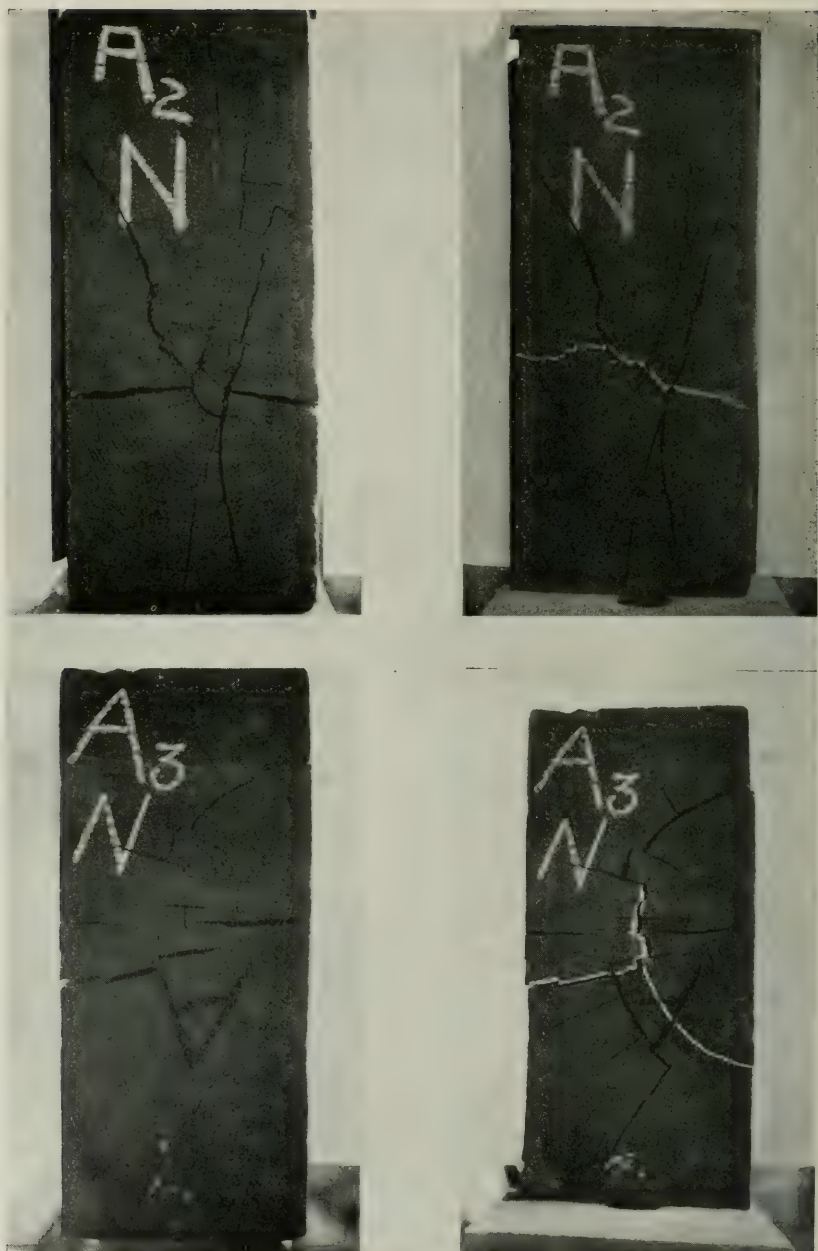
VIEWS OF ENDS OF BEAMS BEFORE AND AFTER FAILURE.
